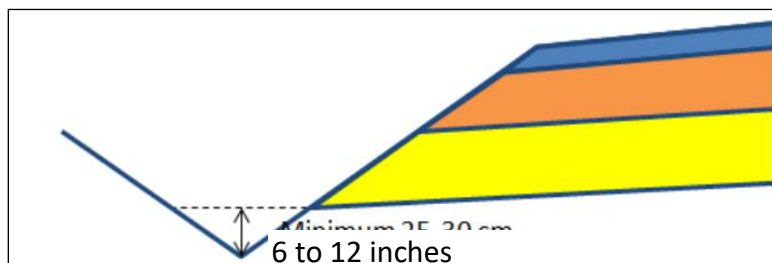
Adequate Drainage below Pavement Structure (6, 10).
